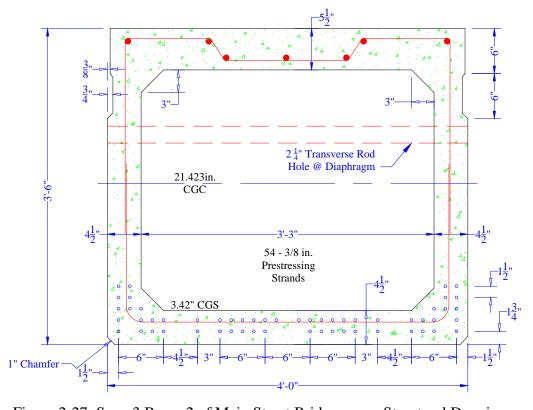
Span 3 Beam 2 of Main Street Bridge as per Structural Drawings
